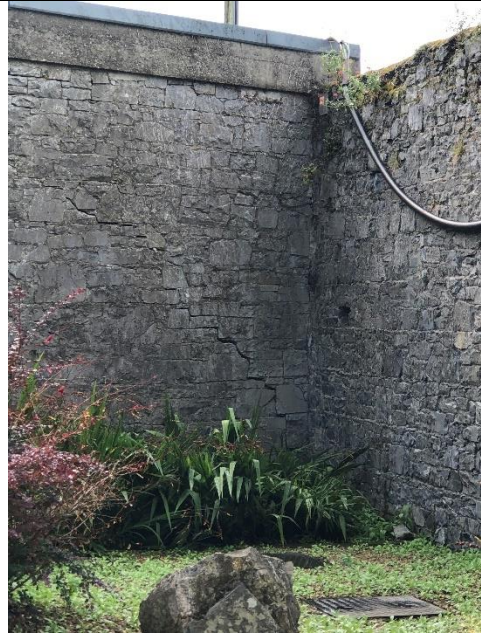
Crack visible in adjacent wall, near septic tank where access covers are visible.
